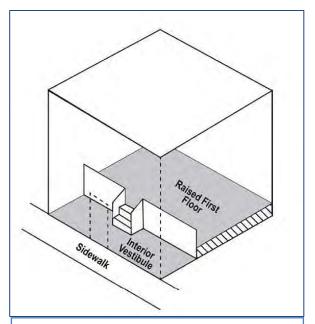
Configuration of elevated interior floor that leaves street entrance at grade.
